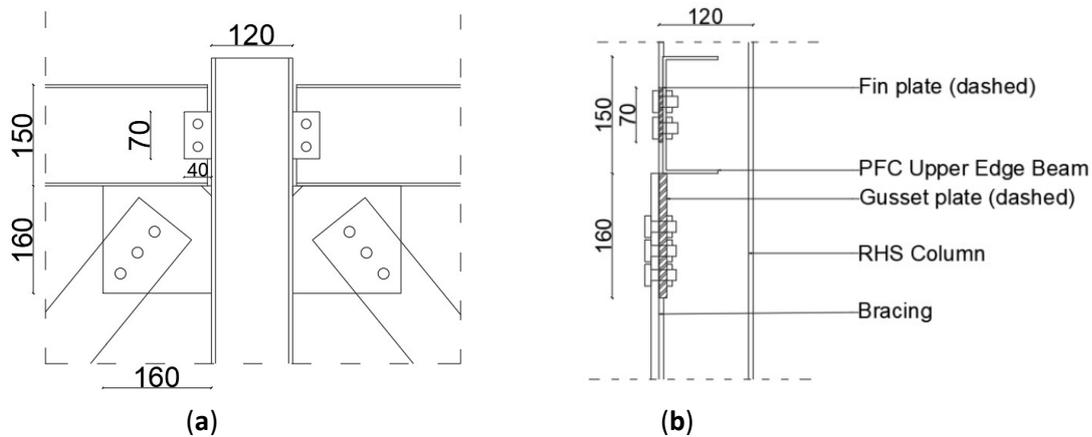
Bracing connection below ceiling height: (a) Side view, (b) Cross-section (own work).
